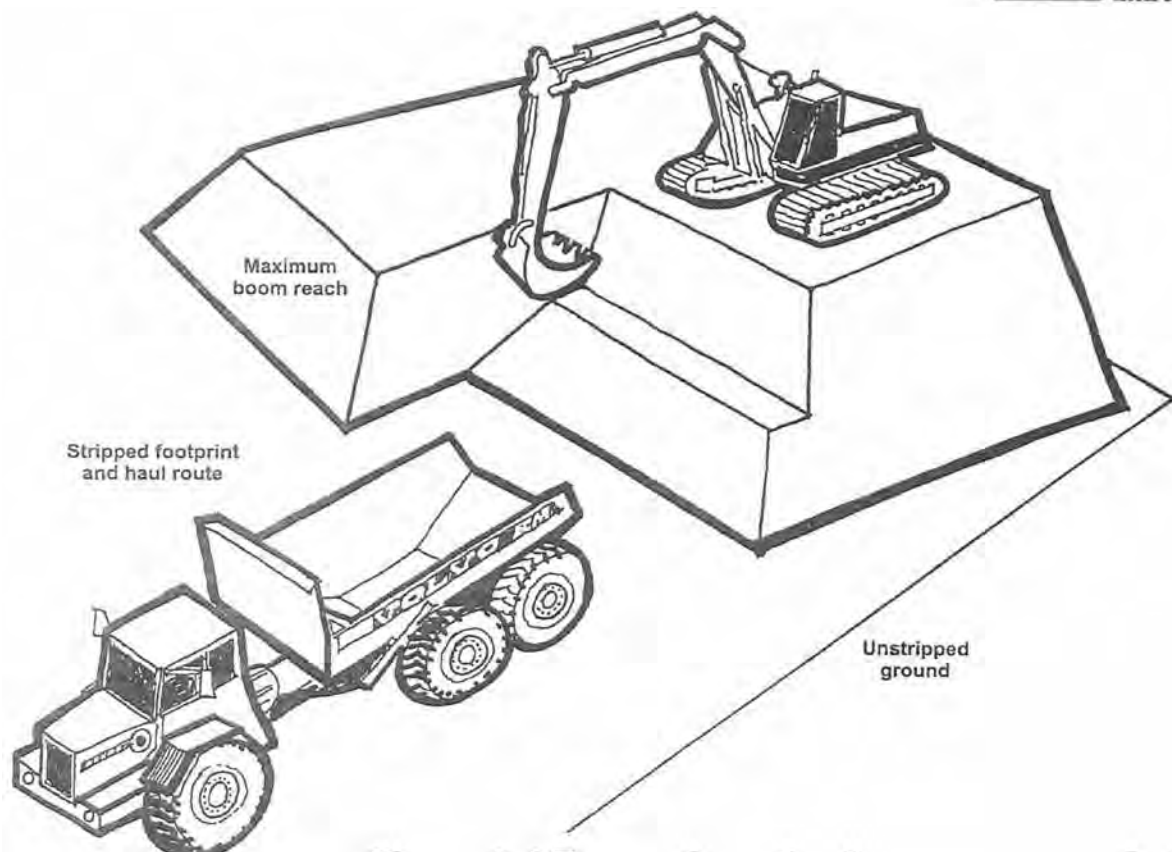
Excavation of storage mound with excavators and dump trucks:
